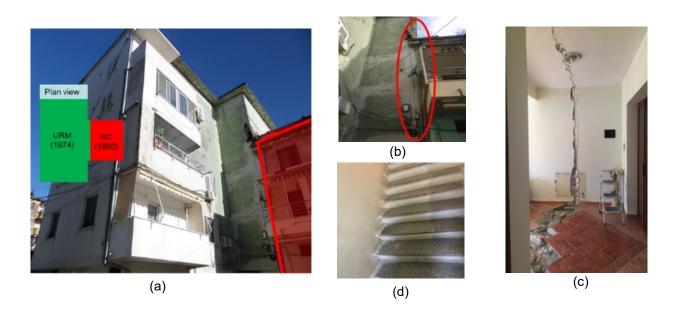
Damage patterns in mid-rise URM buildings: (a) five-story communist-era URM buildings made of silicate bricks and hollow core precast concrete slabs inspected in Lezhë (red tagged by local engineers), (b) pounding damage between the URM building and reinforced concrete building, (c) a gap opening, and d) detachment of the staircase (photos: EEFIT).
